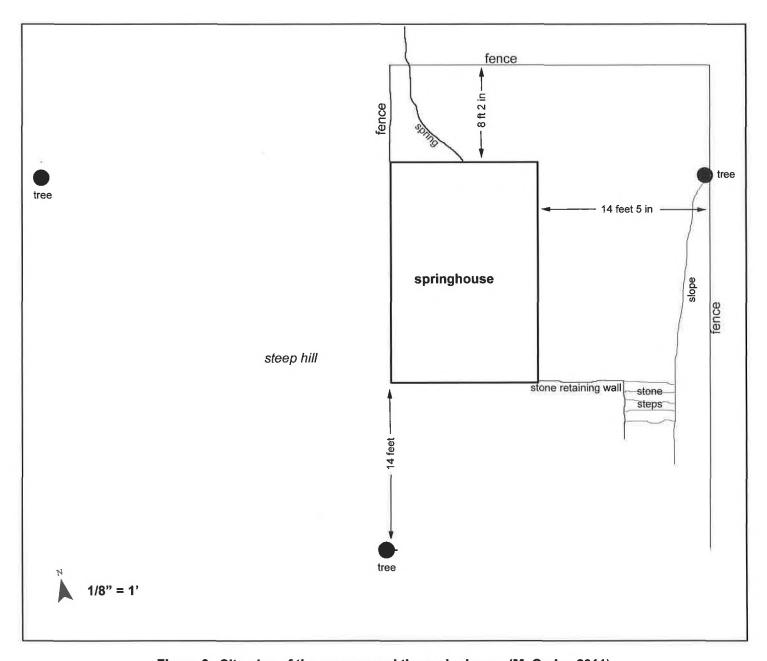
Site plan of the area around the springhouse (McCarley 2011).
